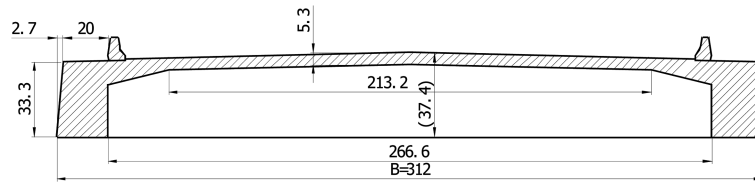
Scaled section model for wind tunnel testing (unit: mm)
